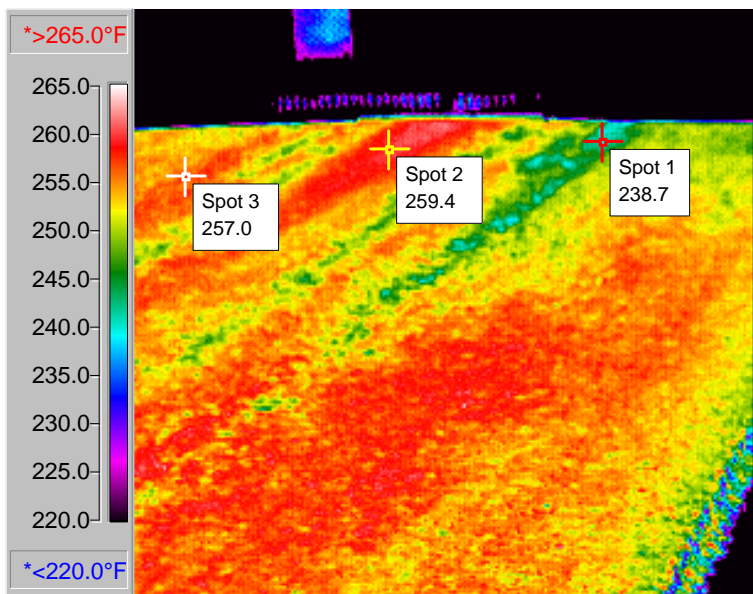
Site 3 - Route 8 in Thomaston, Behind Paver's Screed.
